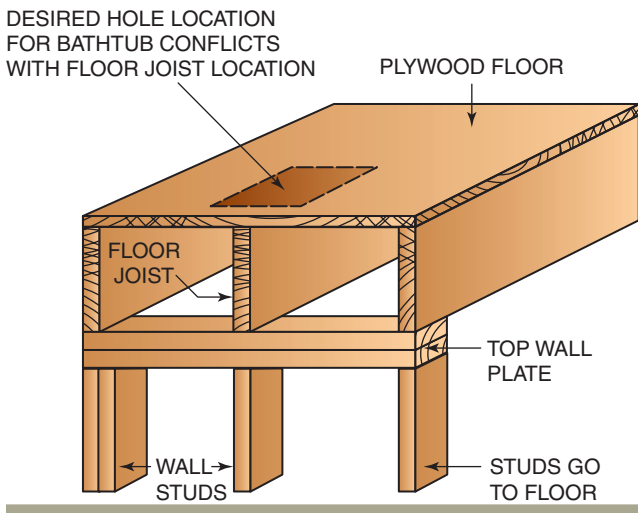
Floor joists often conflict with fixture drain locations.
